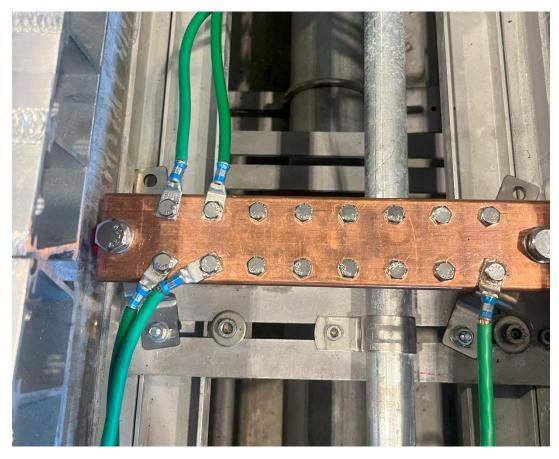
Grounding Bus installed in ILDFA prefabricated aluminum trench for termination of grounding points.
